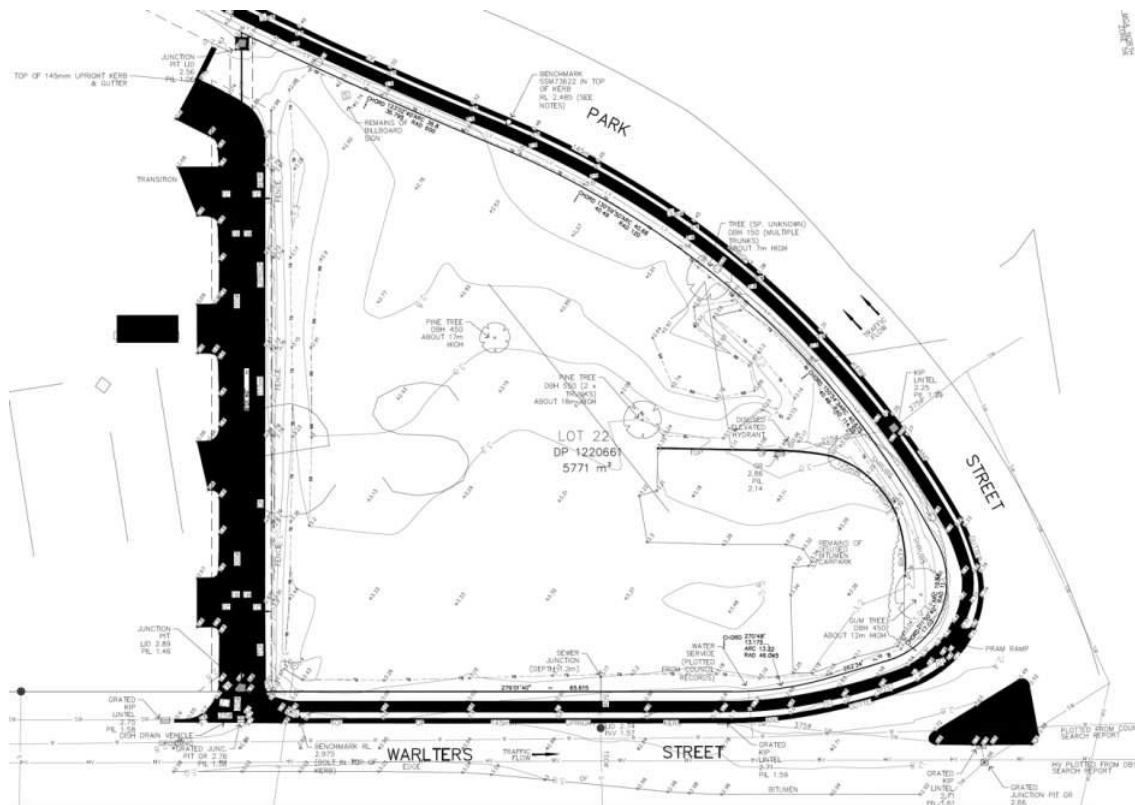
Deposited Plan – identifying details for the site being Lot 22 in DP 1220661
